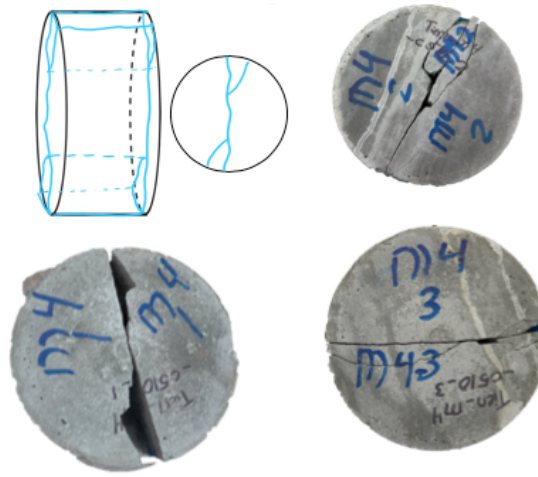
Typical failure patterns of a 6 inch x 4 inch mortar specimen.
